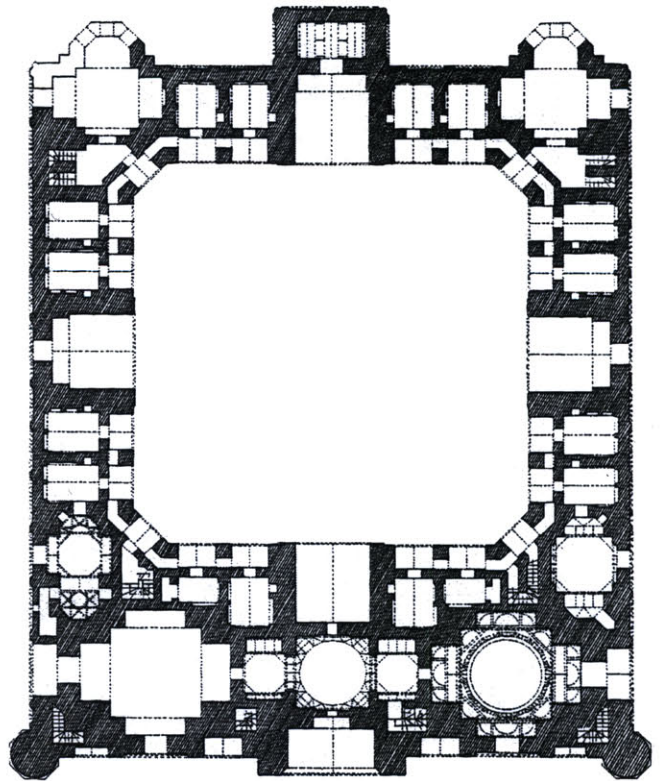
, Madrasa al-Ghiyasiyya, plan of second floor.
